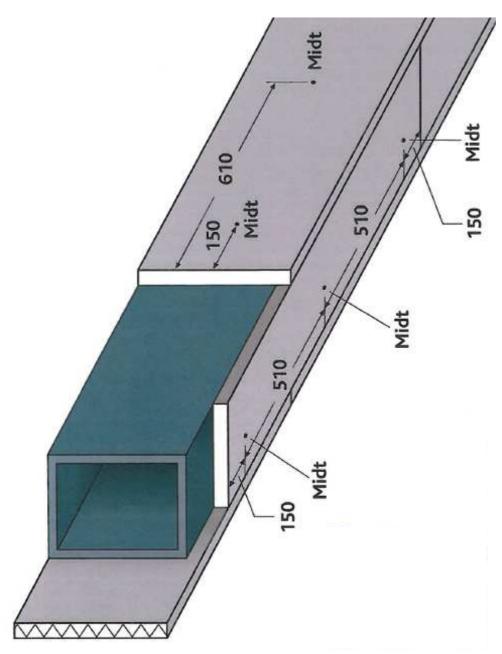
Position of shot nails in closed profiled steel – three sided Shot nails length 37 mm with Ø30 mm washer used for 25 mm fire protection Shot nails length 62 mm with Ø30 mm washer used for 50 mm fire protection Midt = centre
